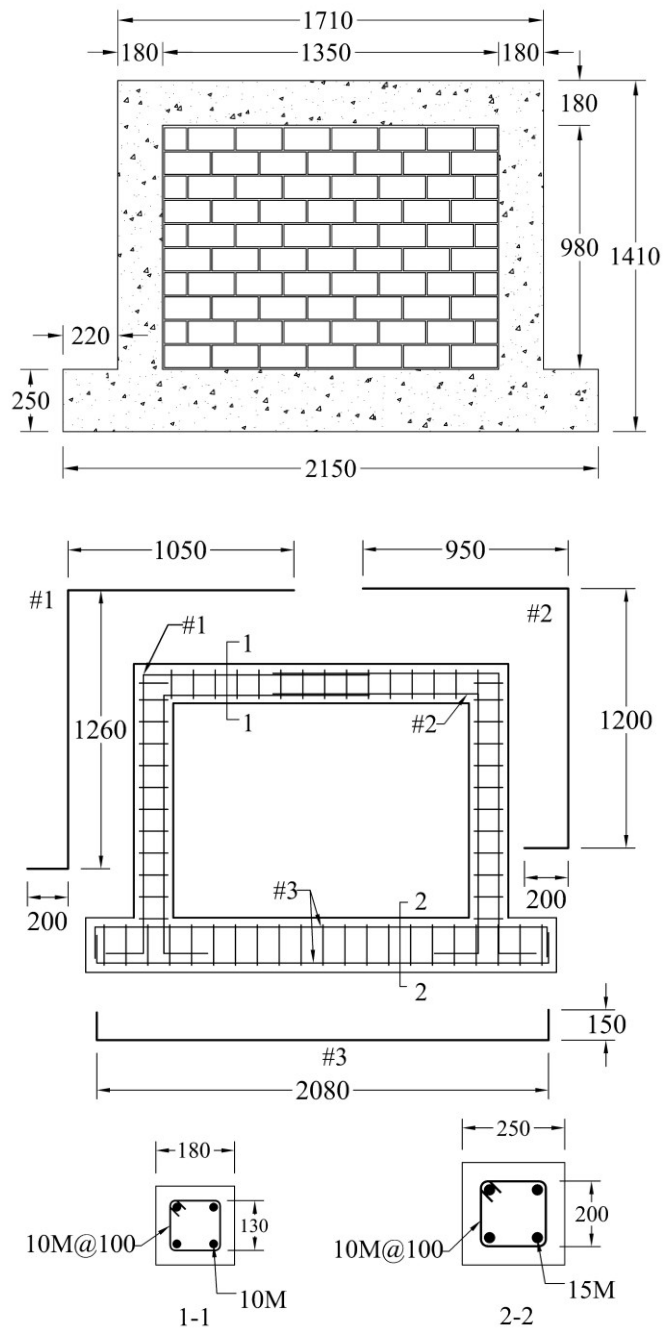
Geometric properties of specimens and reinforcement details in the RC frames
